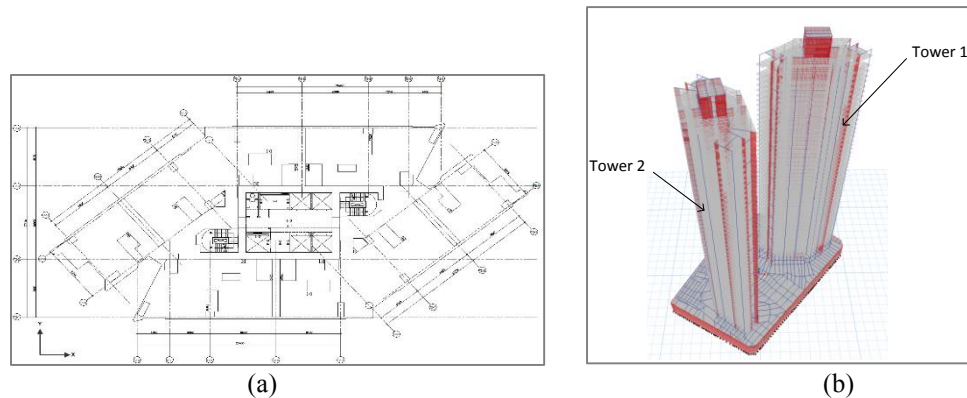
(a) Typical floor plan, (b) Isometric view of towers
